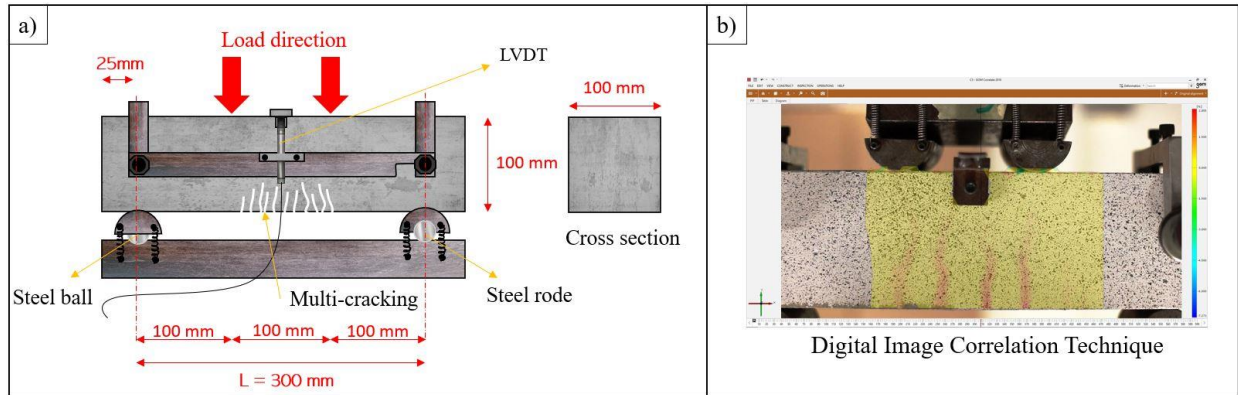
Four-point bending test, a) setup and dimensions, and b) DIC technique used in the test to detect cracks and measure the crack widths
